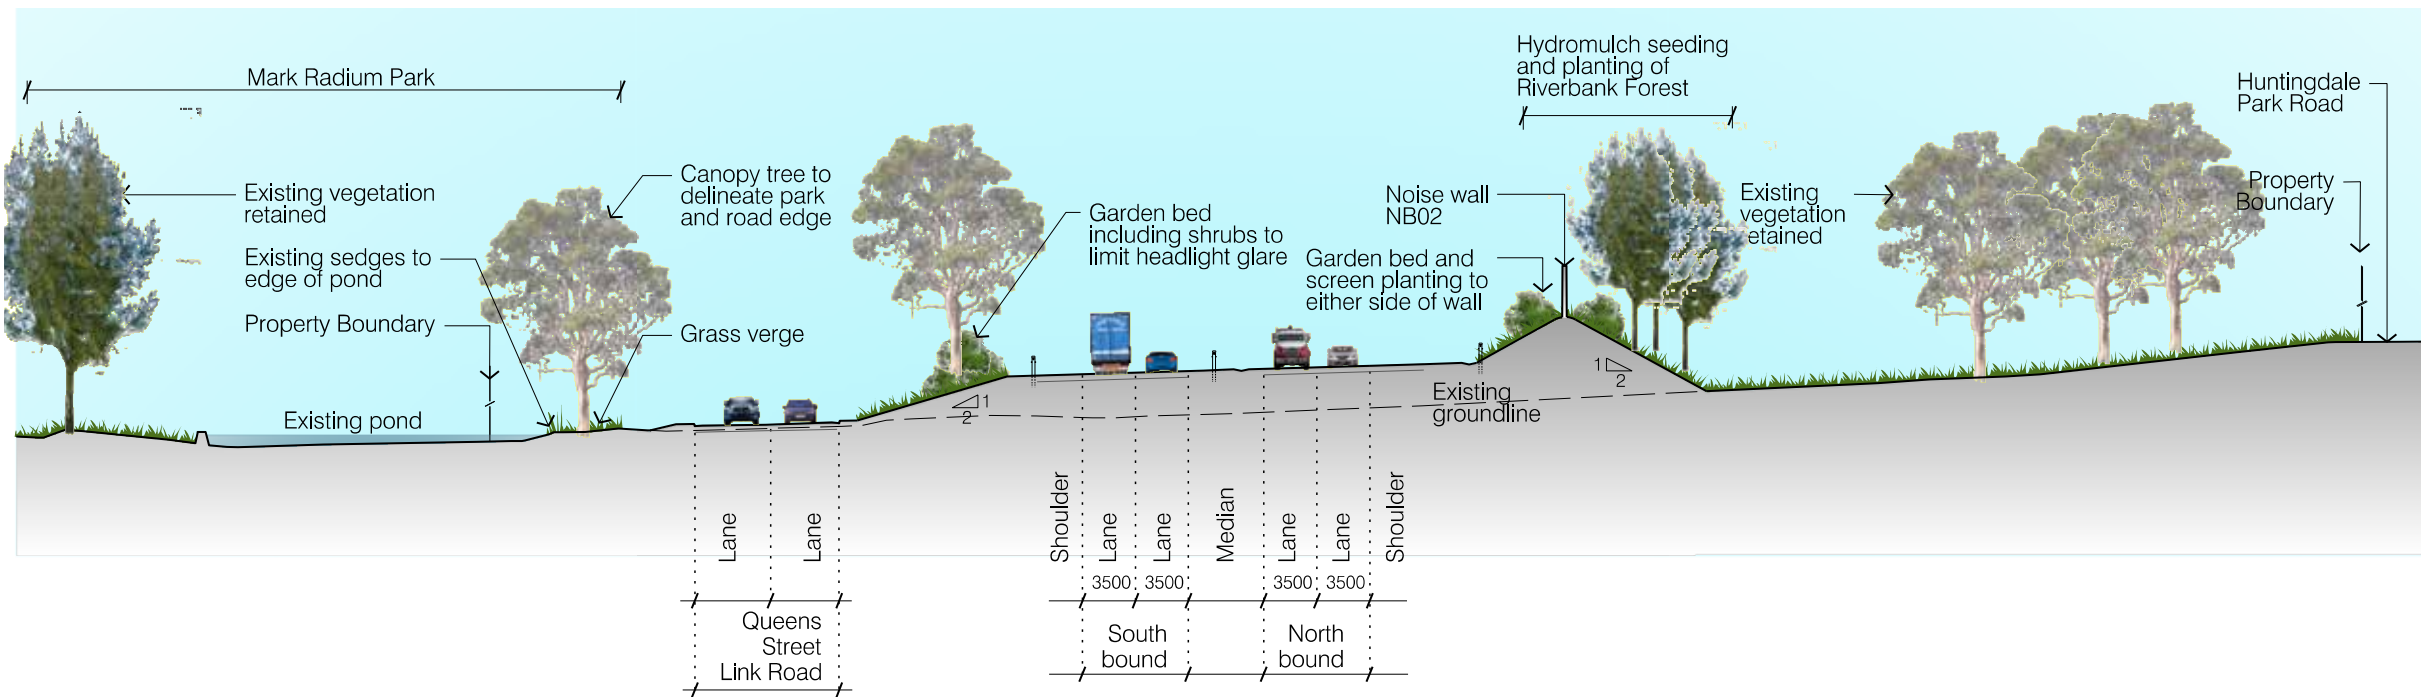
Road cross section at Ch. 17900 (Scale 1:500 @ A3)
